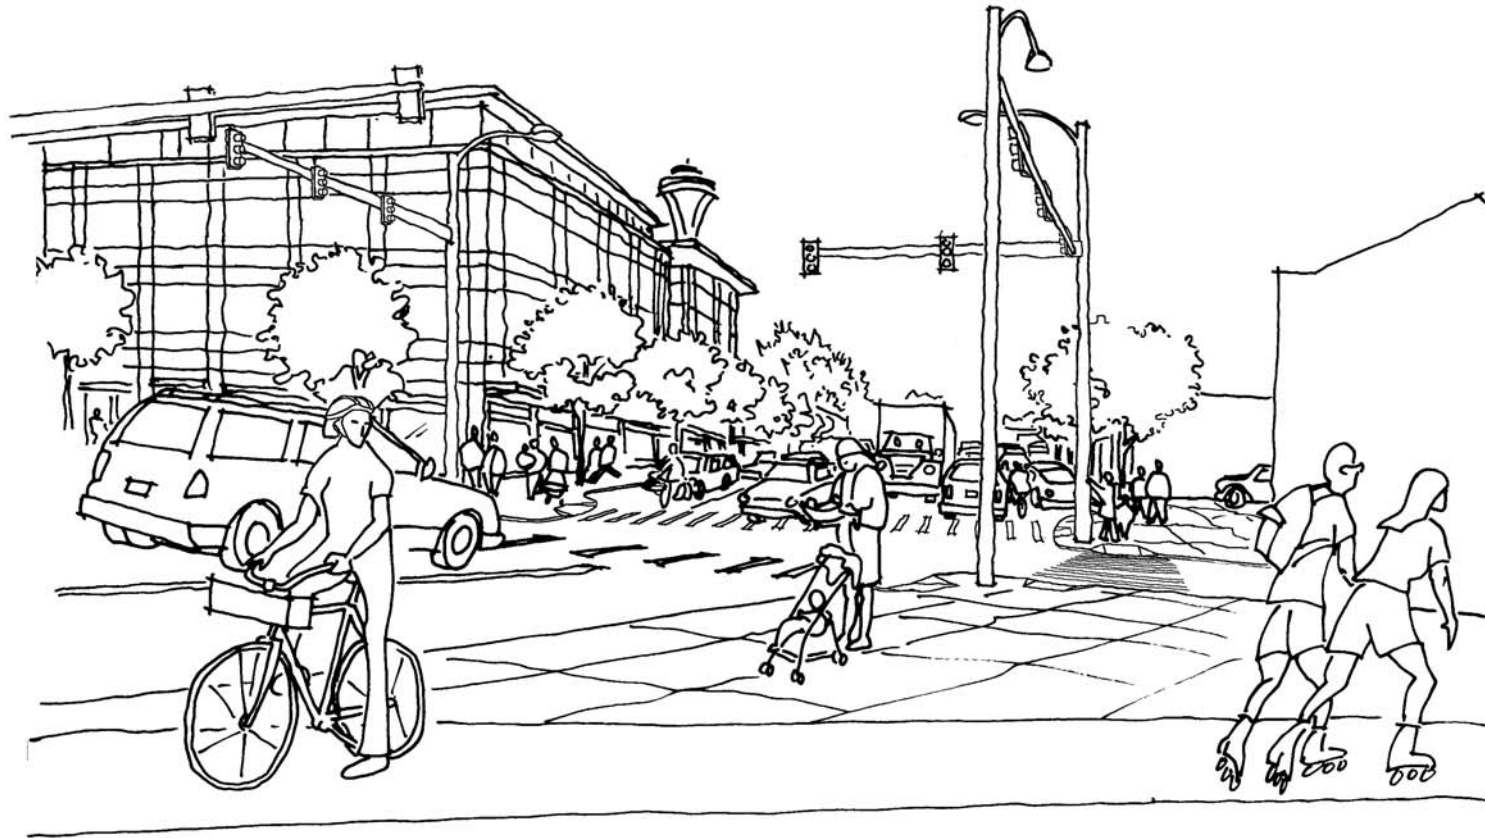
Proposed Valley Street at Westlake Avenue, Looking West
